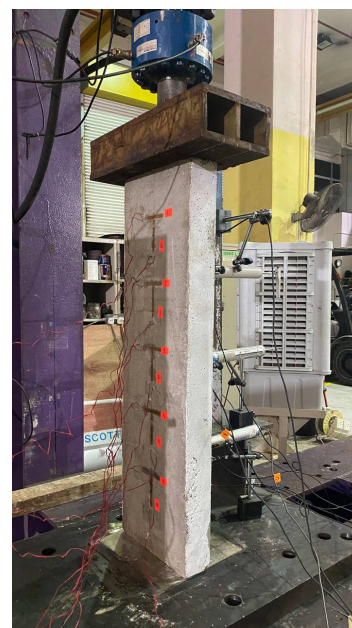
Test Setup for The Wall Panel with All Instruments
